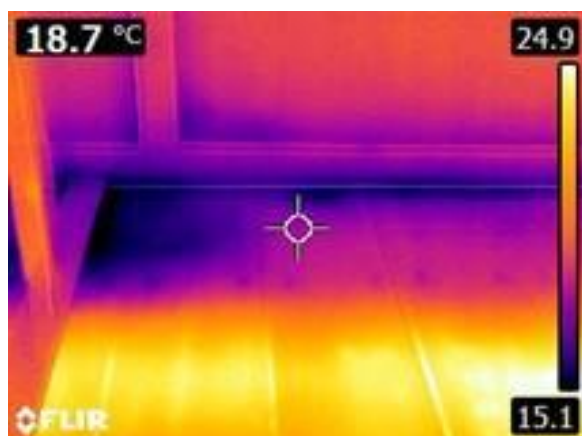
Heat loss via thermal bridging through the wide stone foundation – Image © Landsverk
